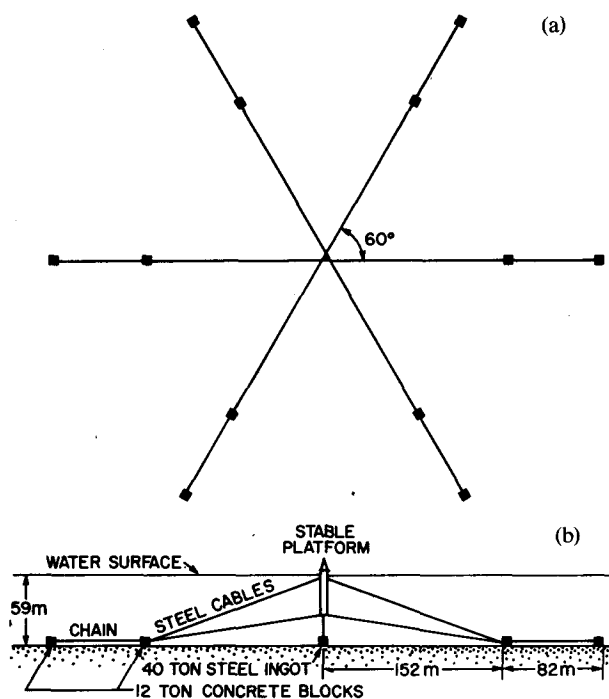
Mooring of the stable platform, (a) plan, (b) elevation, with only two pairs of the concrete anchors shown.
